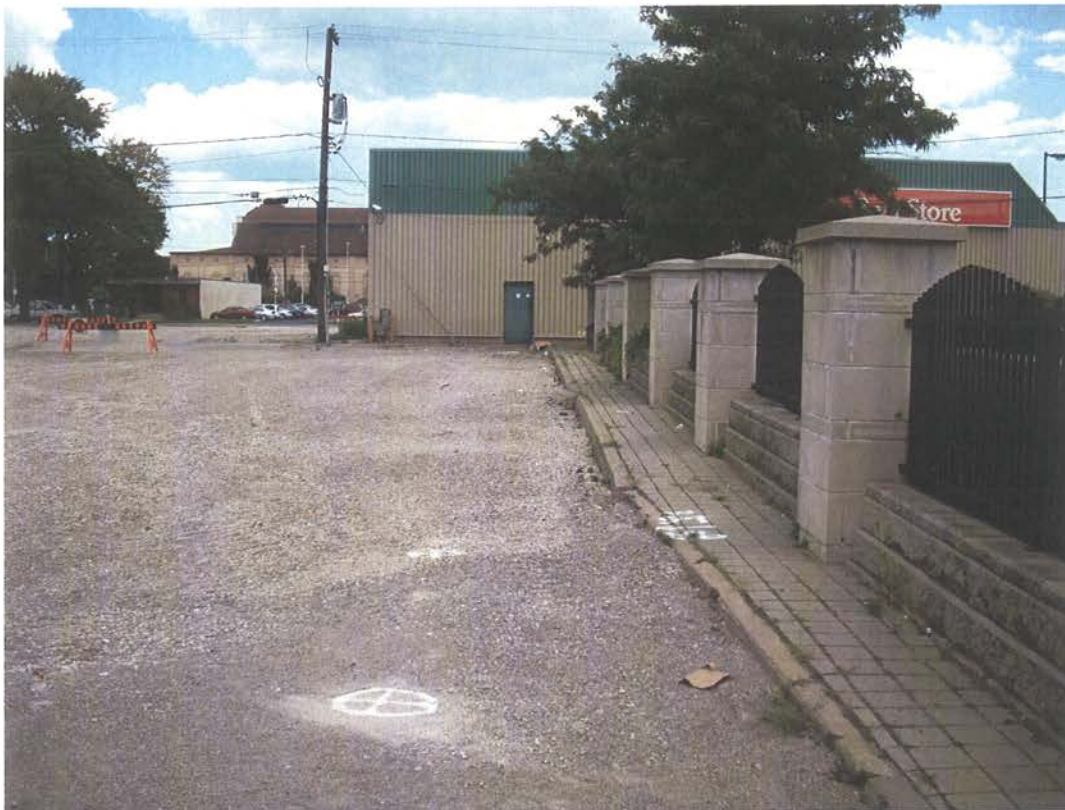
Photo taken looking south showing the proposed location of the Maintenance Building
